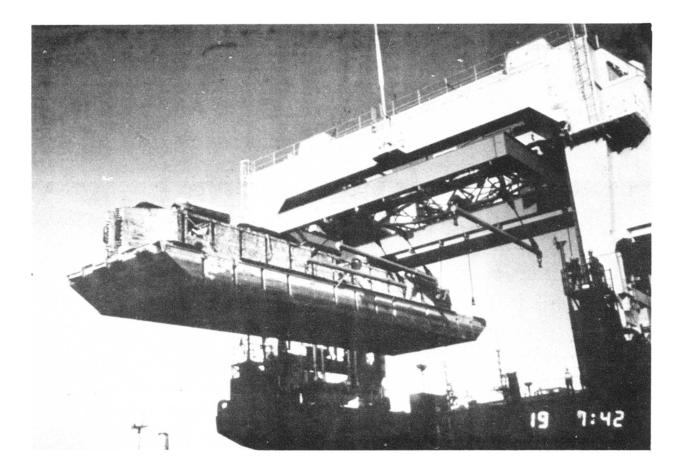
ELCAS Fender Sections on Roadway Section (Lift 5)
